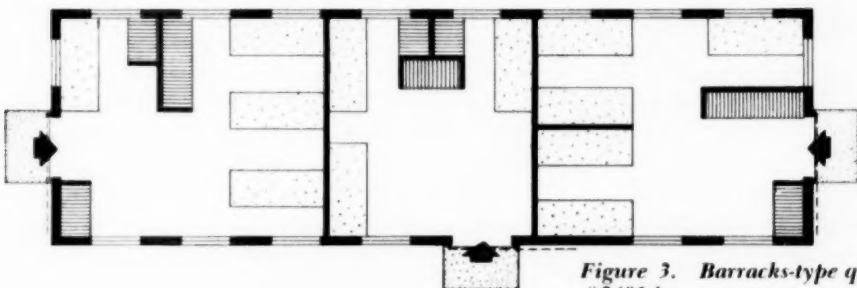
Barracks-type quarters for 24 men. Plan #2401A
